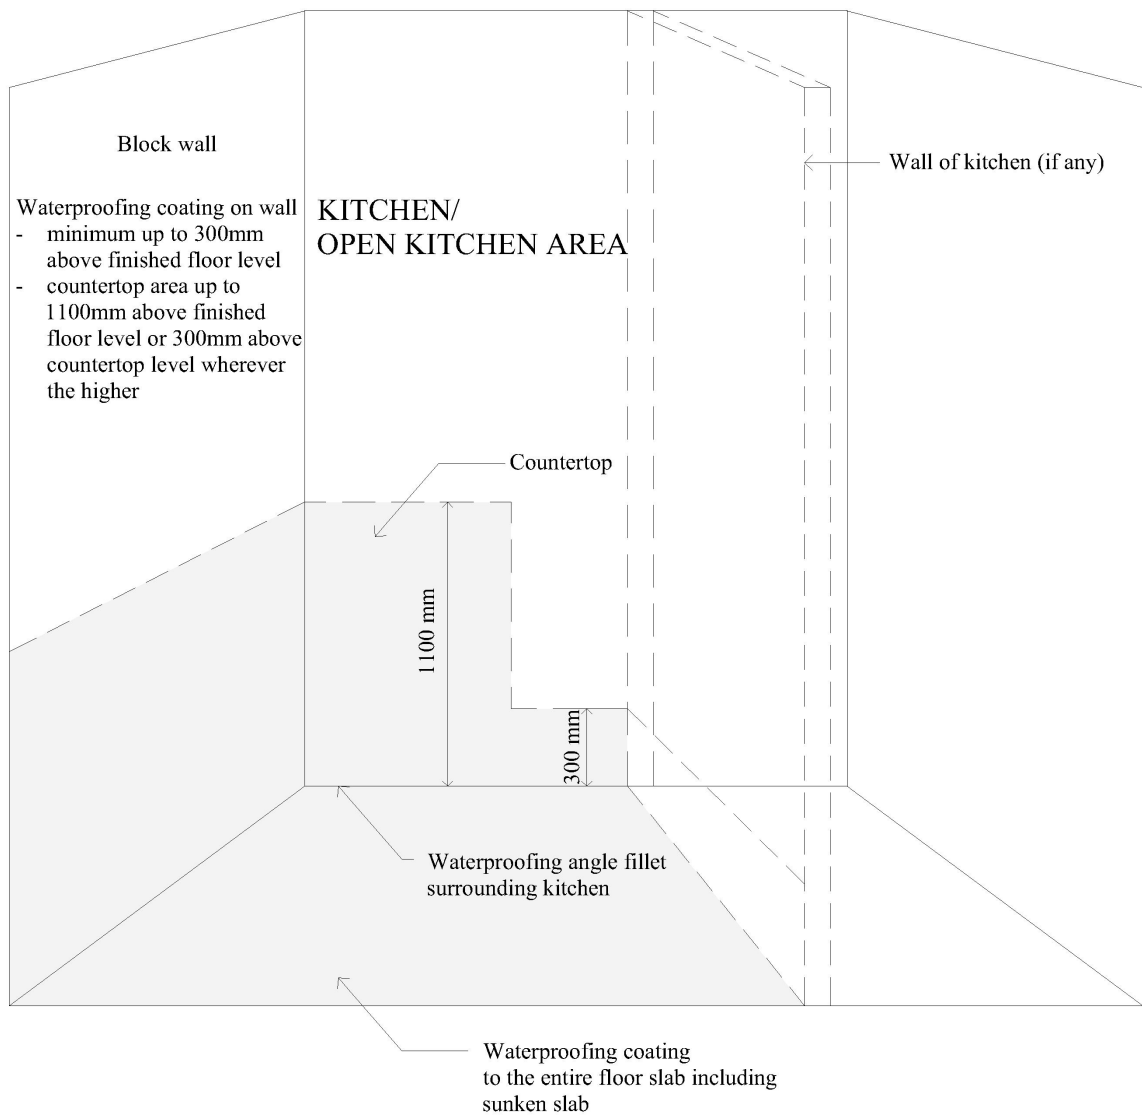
Extent of Waterproofing Works in the Kitchen (including Open Kitchen)
